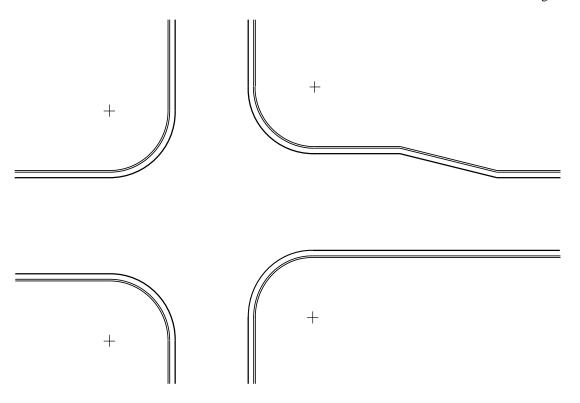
Typical Joint Layout for a Rigid Pavement Intersection (Shows Lane Configuration, Step 1)
